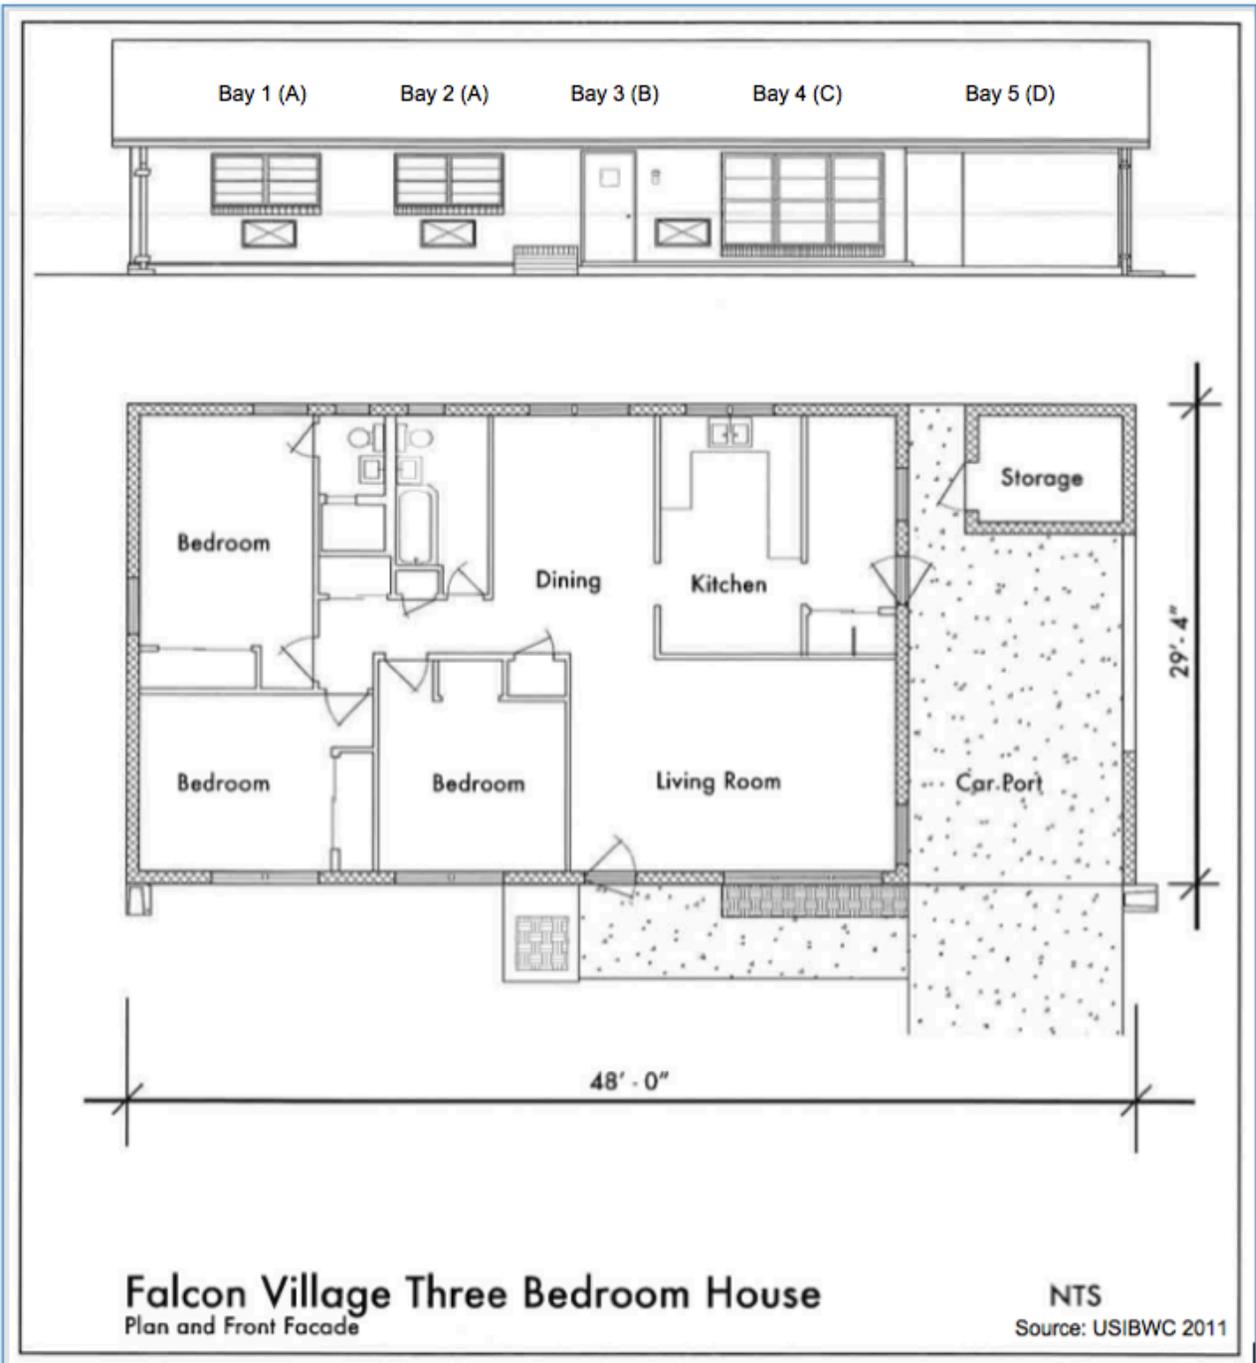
Typical Three-Bedroom Floor Plan and Elevation.
